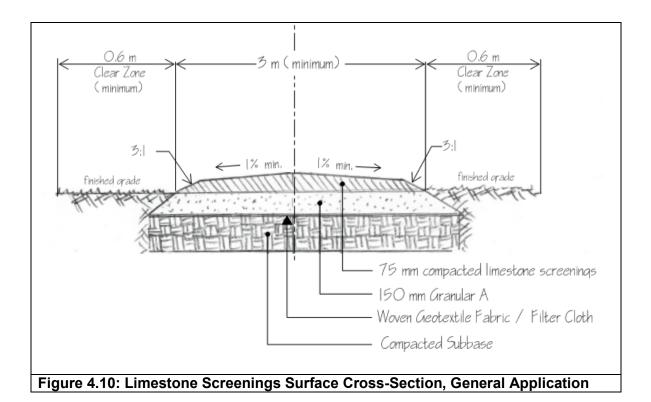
through 4.11 illustrate construction design standards to be used for various trail surfaces. These are considered typical cross-sections only, and may require adjustments as required by specific site conditions.
